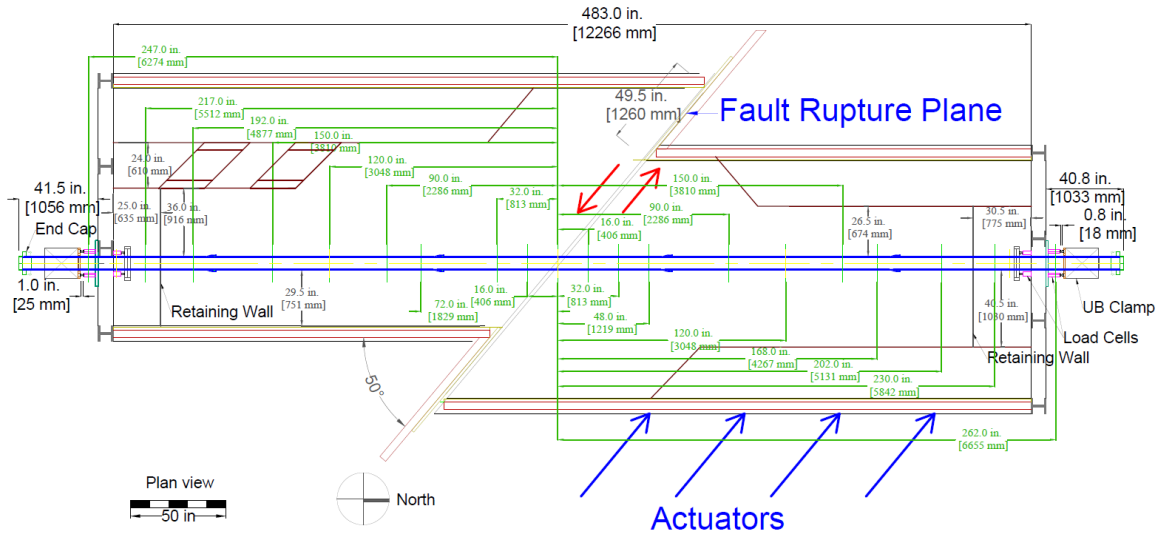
Plan View of Pipe Centered DI Pipeline with AP2 Lining in Test Basin
